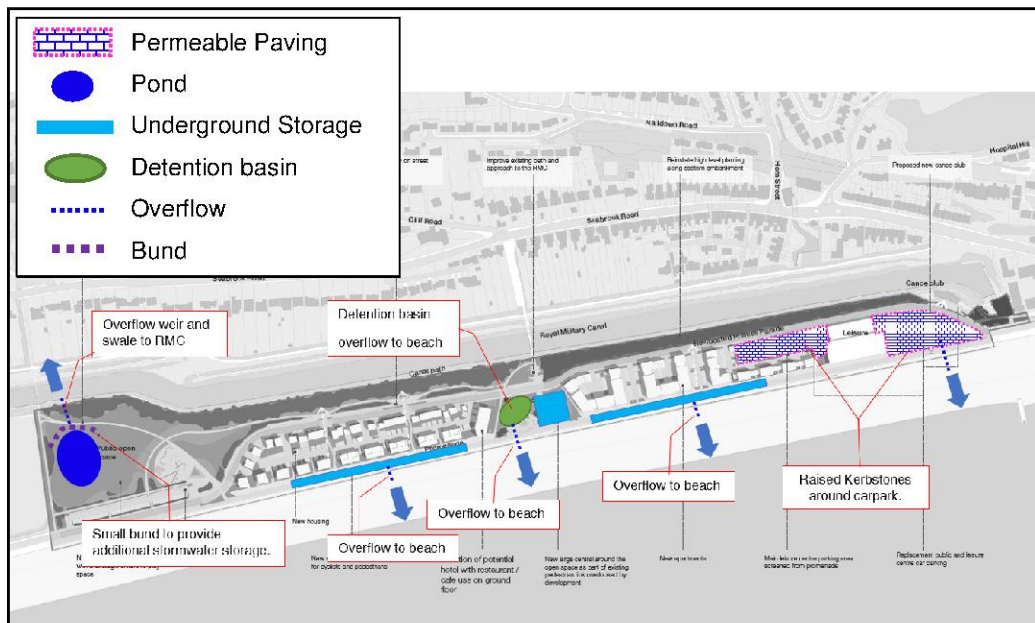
Plan showing proposed SuDS and overflow control systems.
